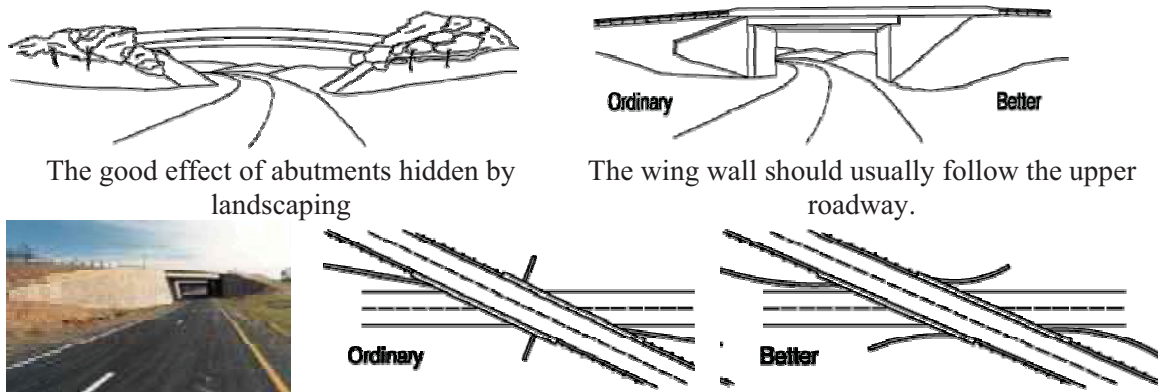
Abutments landscaping and Skewed Wing Walls²
